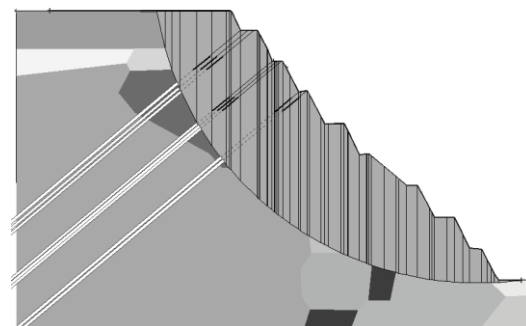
Critical sliding surface of slope with anchors reinforcement.
